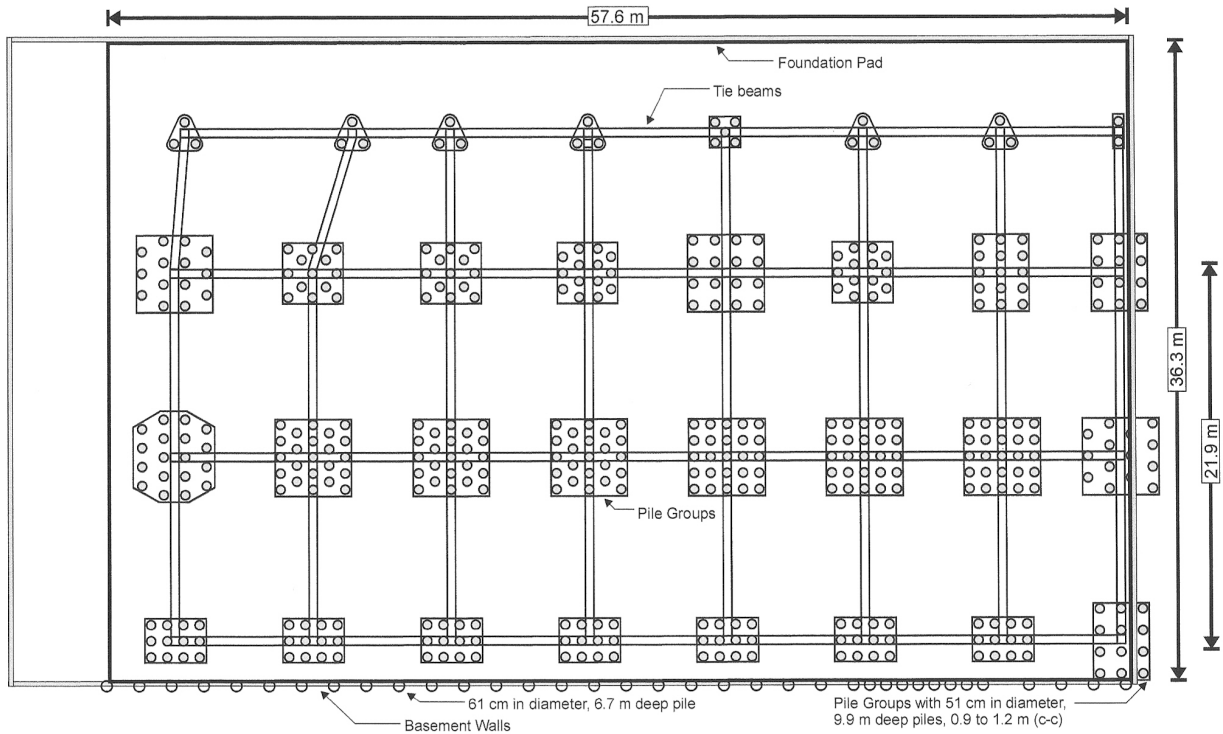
Sherman Oaks building foundation plan, based on construction drawings provided by CSMIP.
